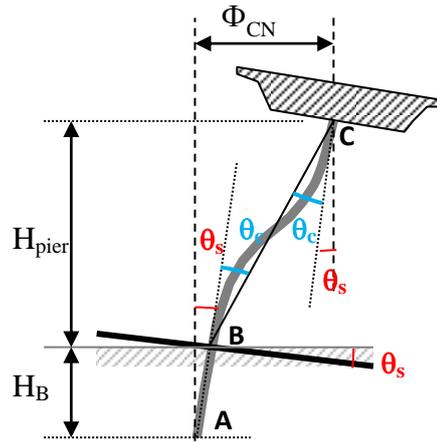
Pier-Foundation Substructure. Contributions to work-equivalent stiffness for cases with compliant foundation
